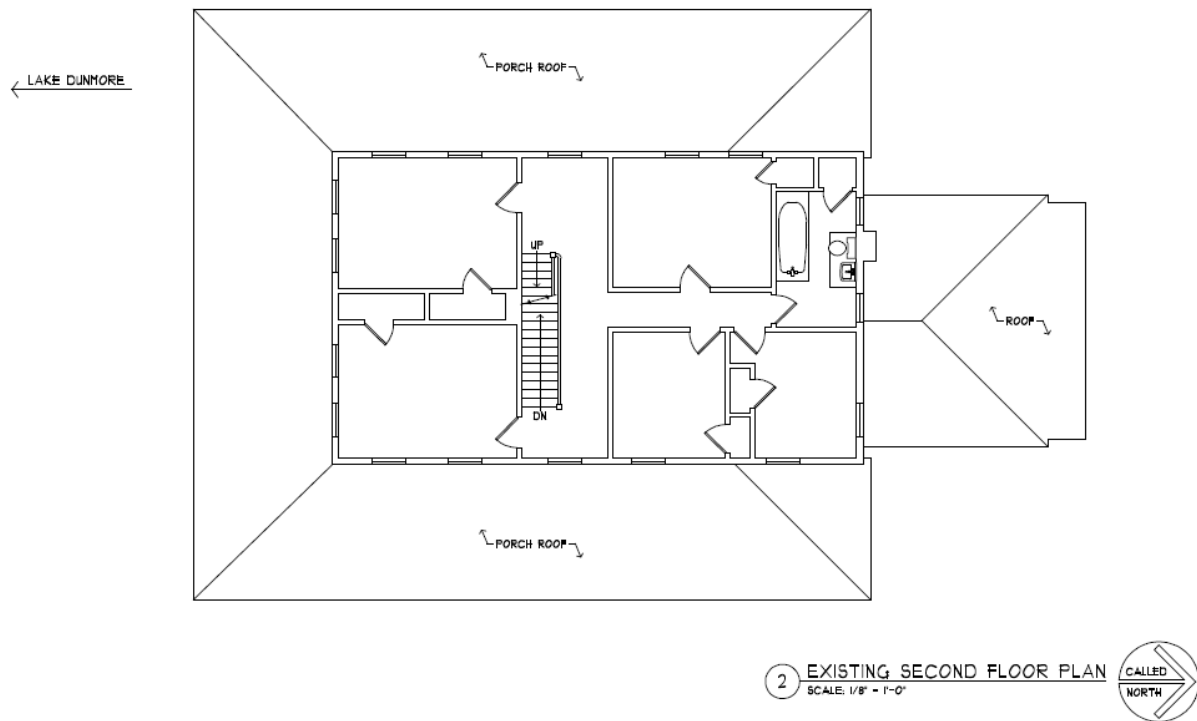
Keewaydin Manor House, existing second floor plan (NBF Architects 2016).
